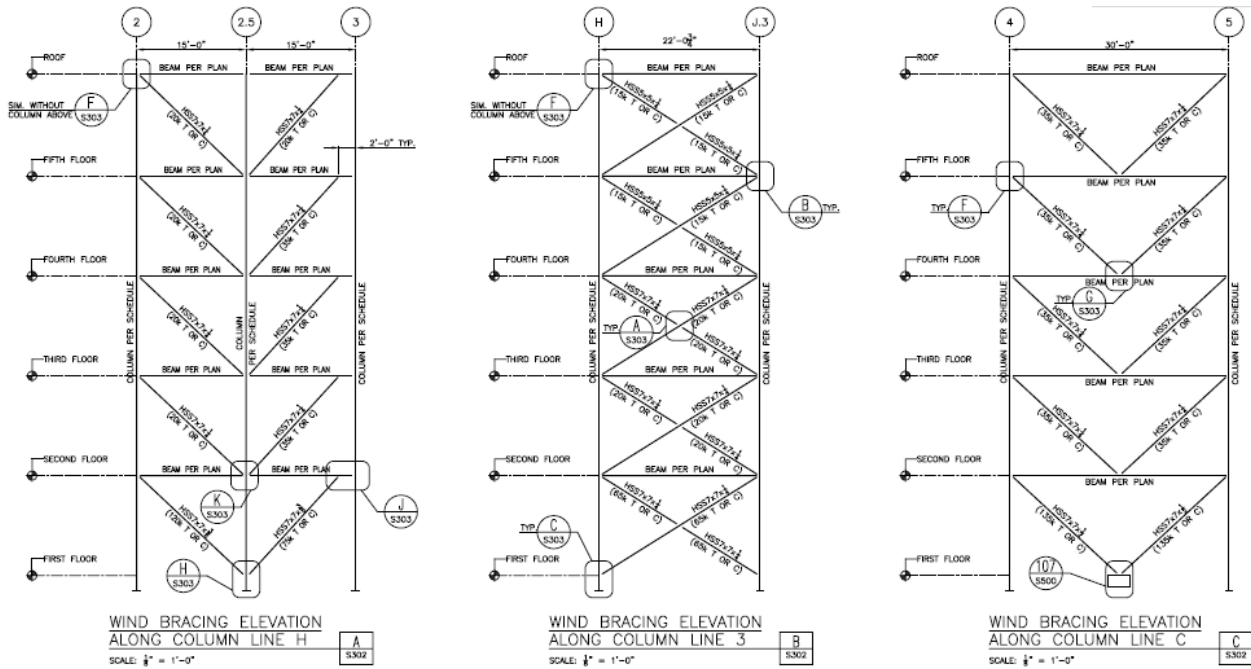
Vertical Trusses A, B and C (VT-A, B, C)
